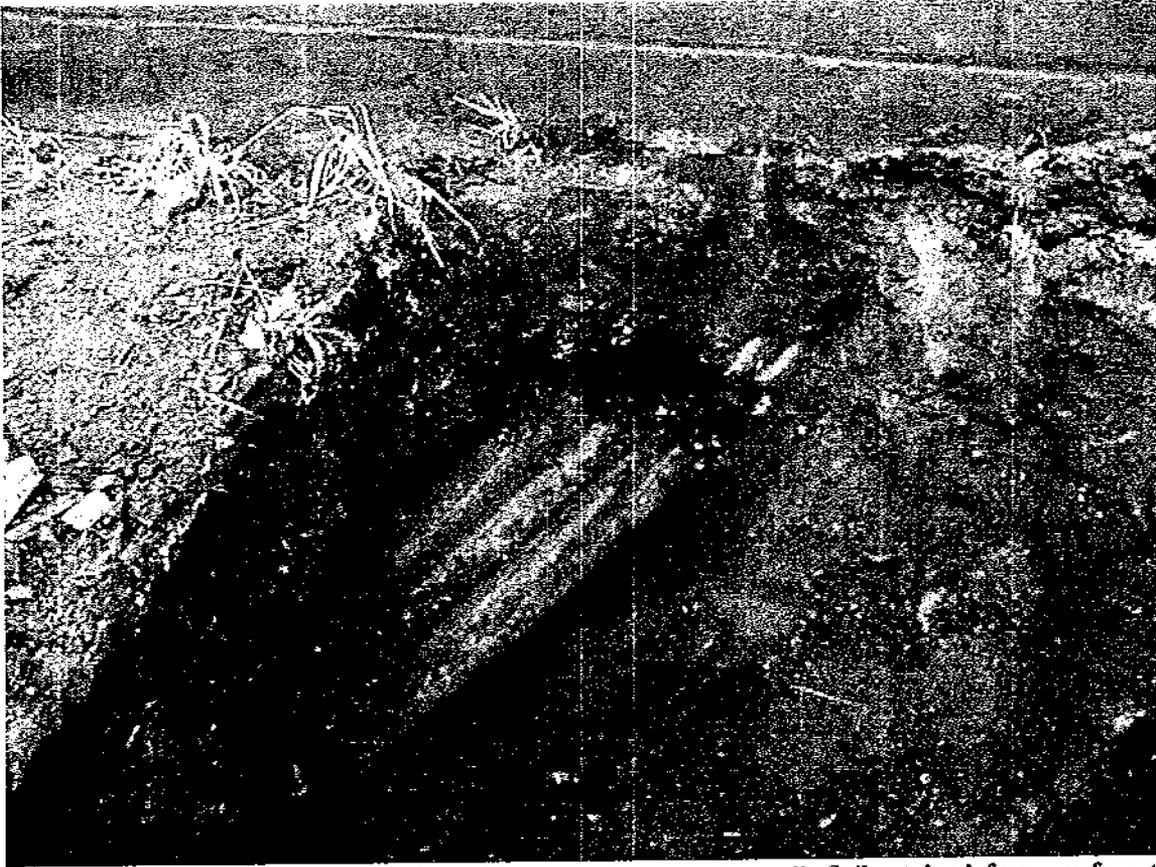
SS #4: Juncture of piping with engine house outer wall. Soils stained from surface to subsurface below piping.
